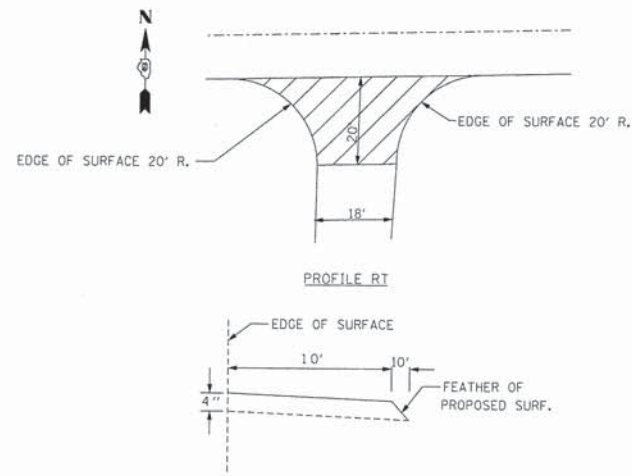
DETAILS OF SURFACING AT INTERSECTIONS AND SIDEROADS
